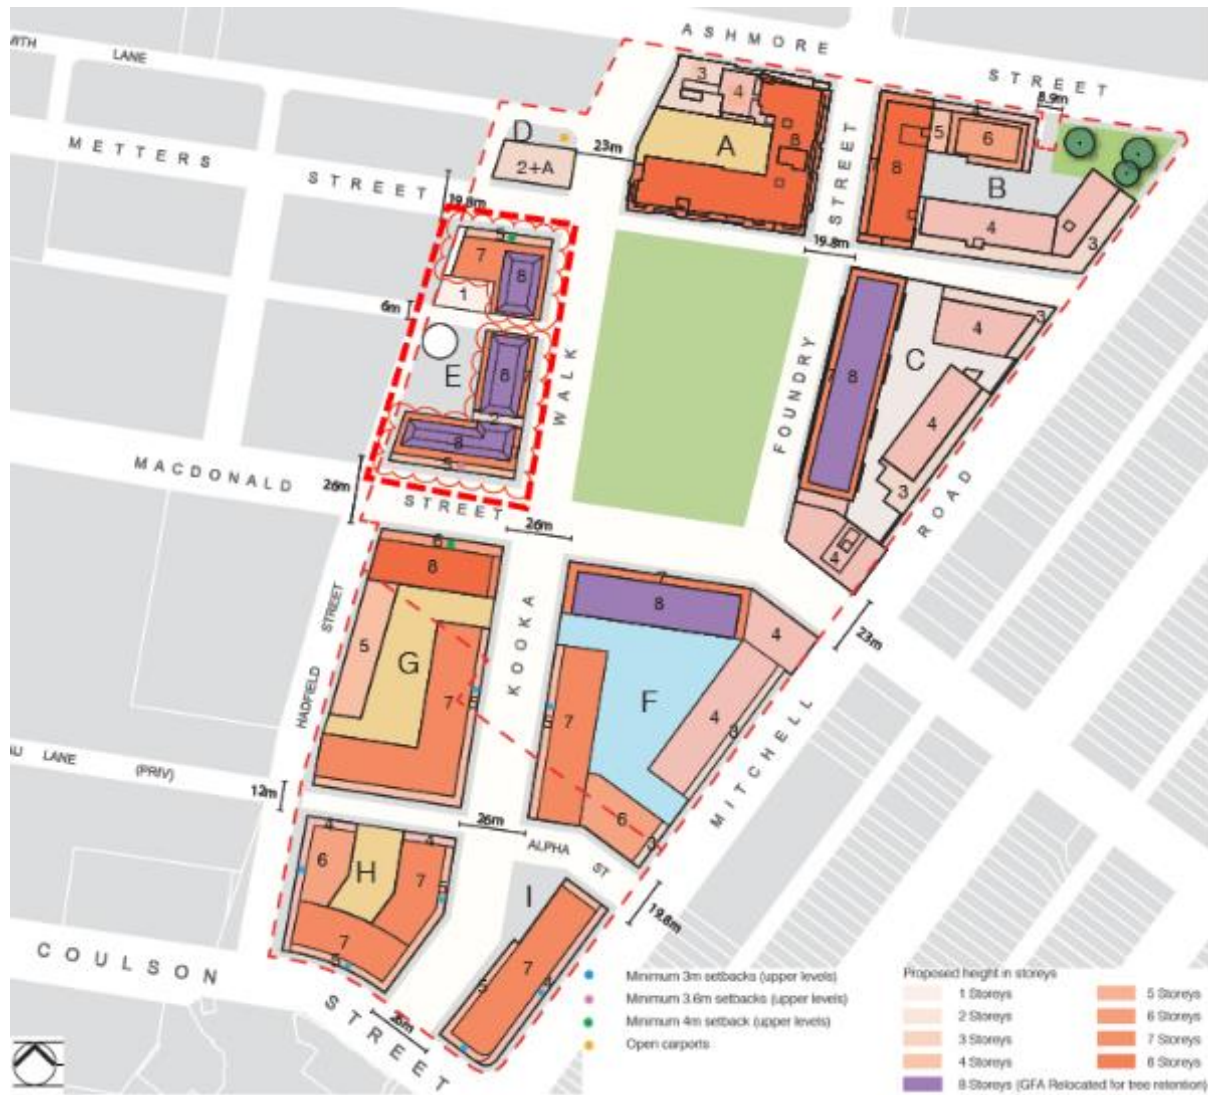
Proposed building envelopes plan (Block E - outlined by red dashed lines and clouded) - D/2015/966/G
